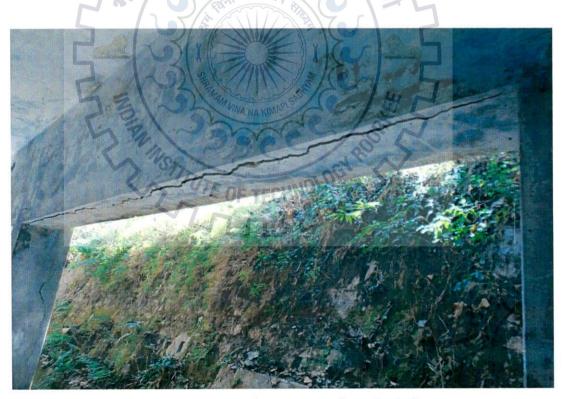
Crack in Beam due to corrosion of reinforcement
